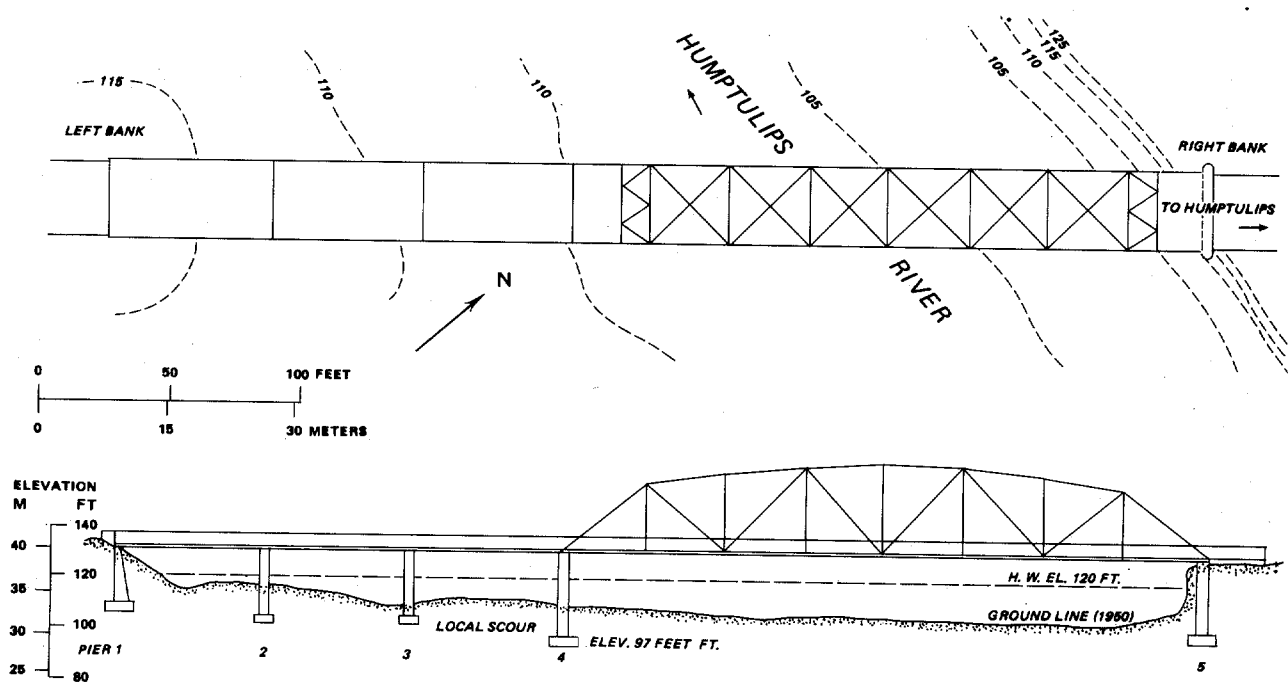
Plan, at top, and elevation, at bottom, of US-101 bridge at Humptulips River.
